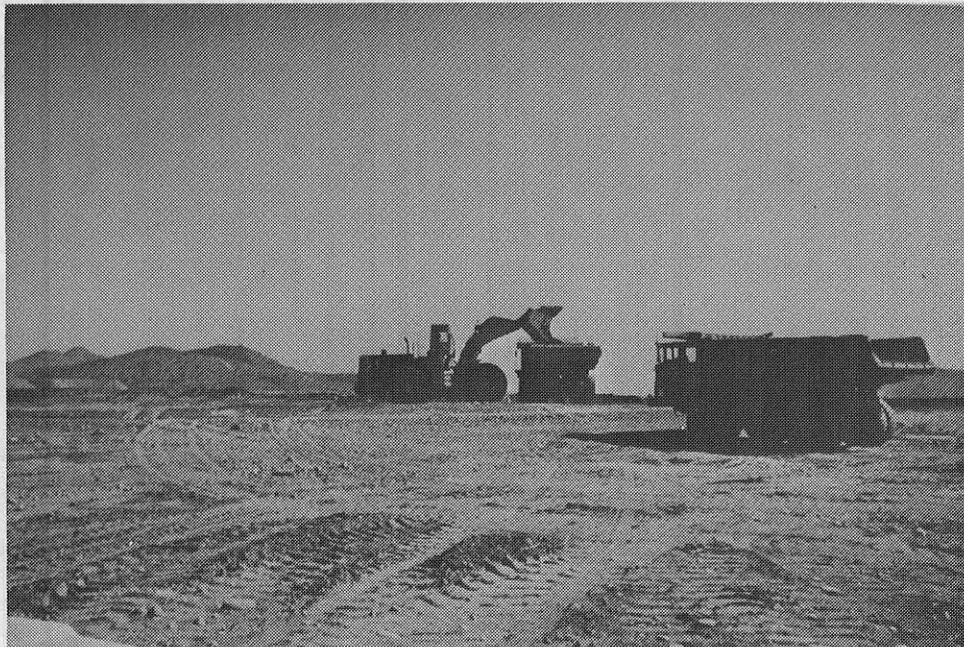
Front end loader loading end dump trucks with core material. April 1984
